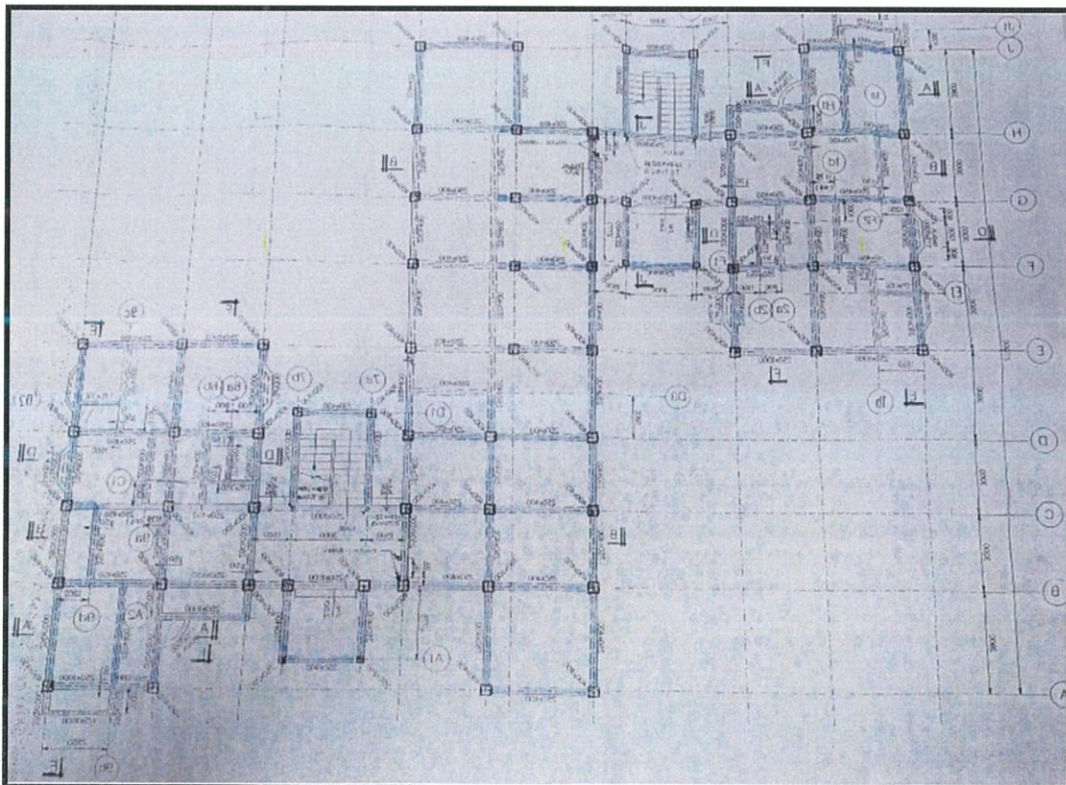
Shows the floor plan of in-situ column at quarters building
